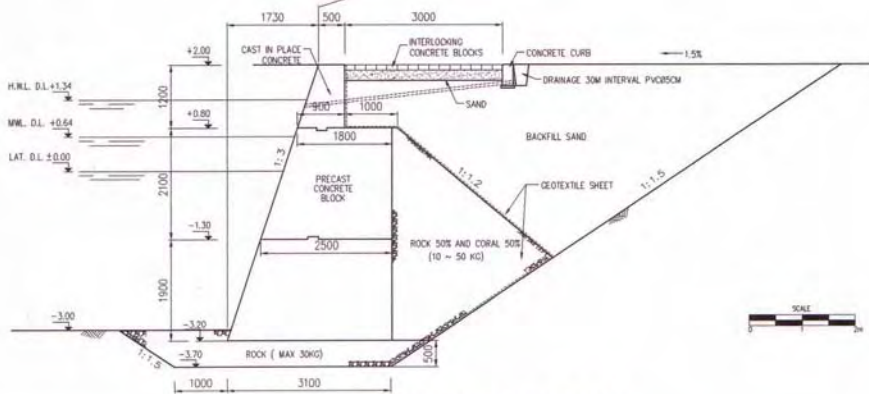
Partial Reconstruction Plan of Quaywall (Depth: D.L.-3.00)
